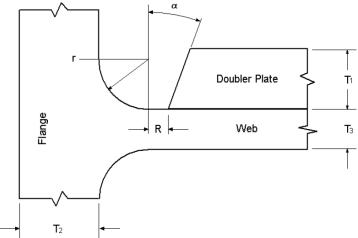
AWS D1.8 Doubler Plate Weld Definition
